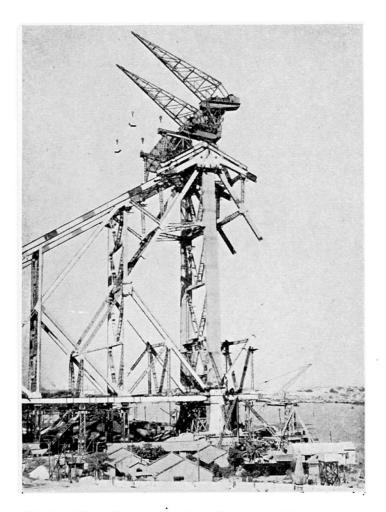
New Howrah Bridge, Calcutta. Creeper crane moving off temporary cradle on which it had been hoisted up anchor arm on to fleeting tracks on cantilever arm
